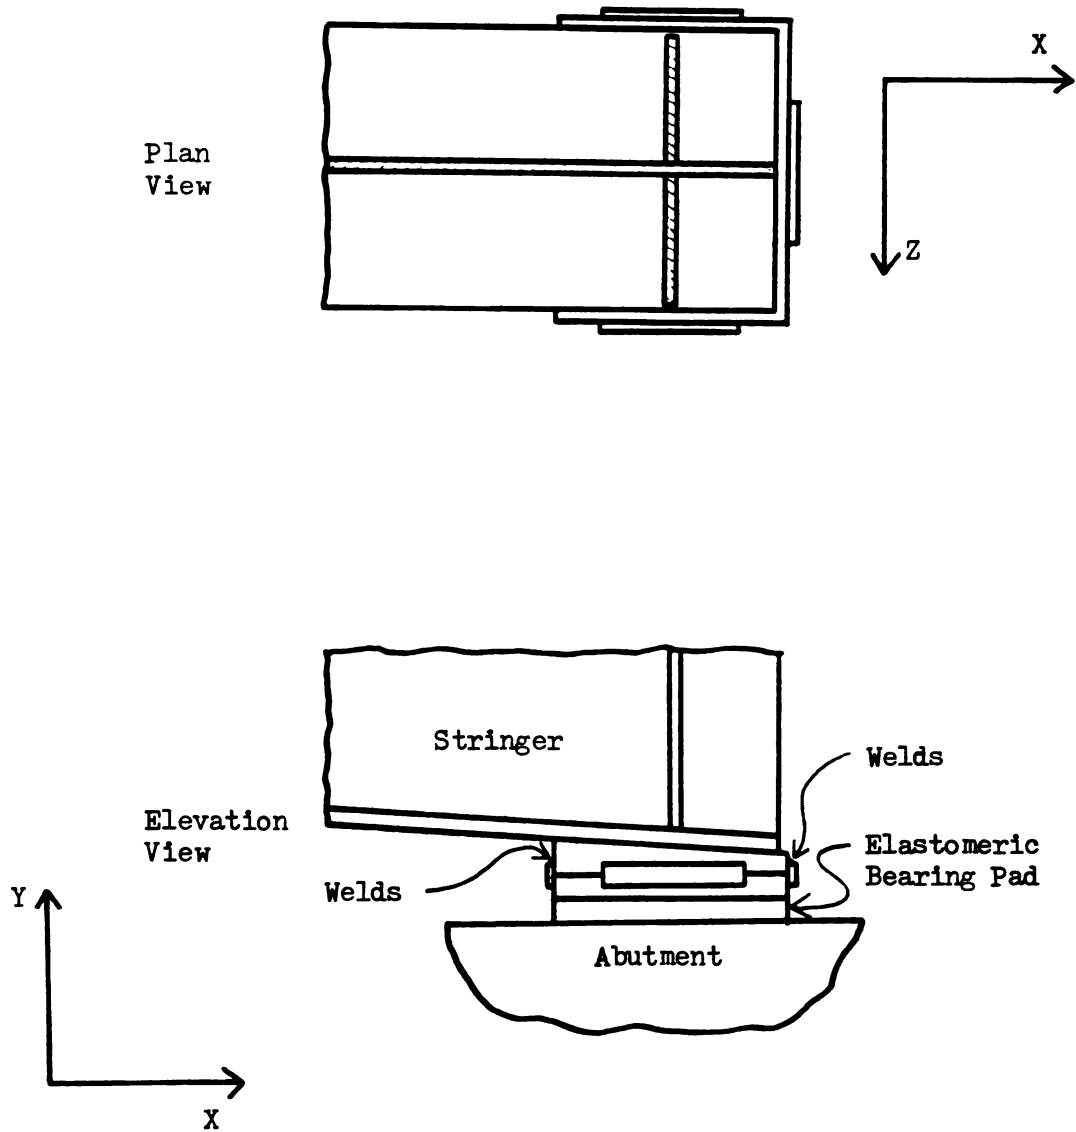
CSCB Deck Bearing Connections at Panel Point 20
